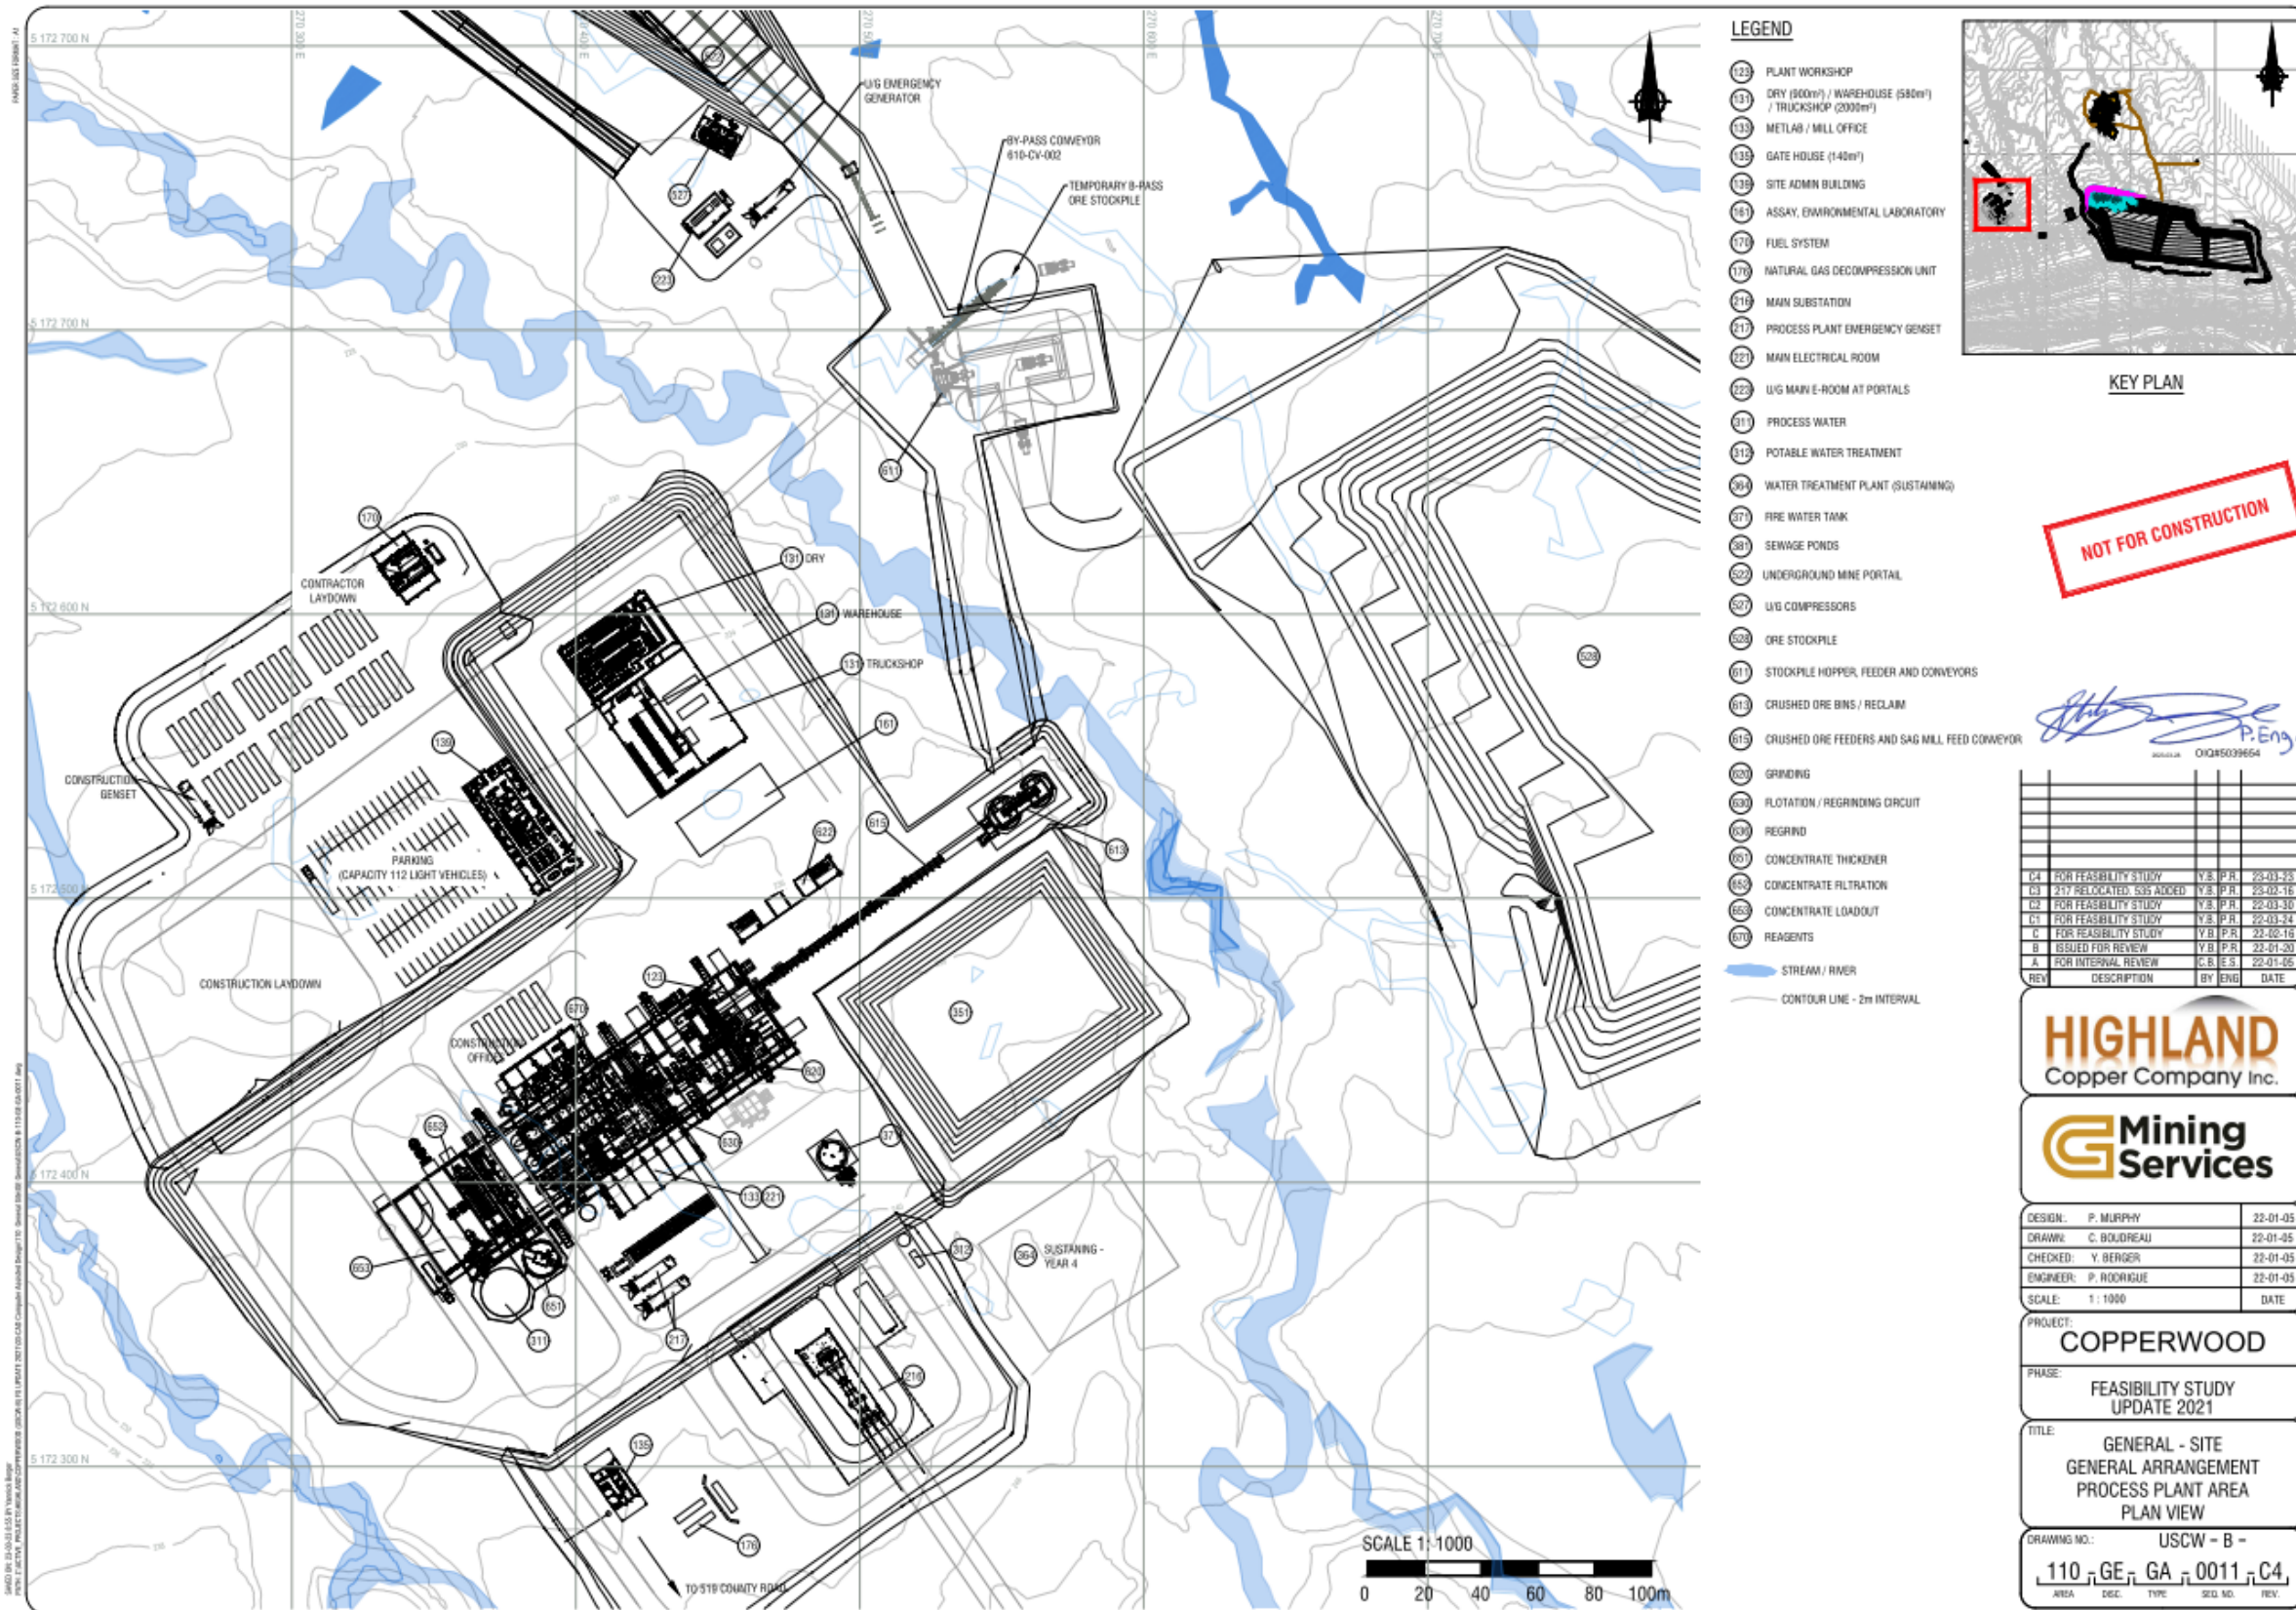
Copperwood Project Plant Site Area General Arrangement
